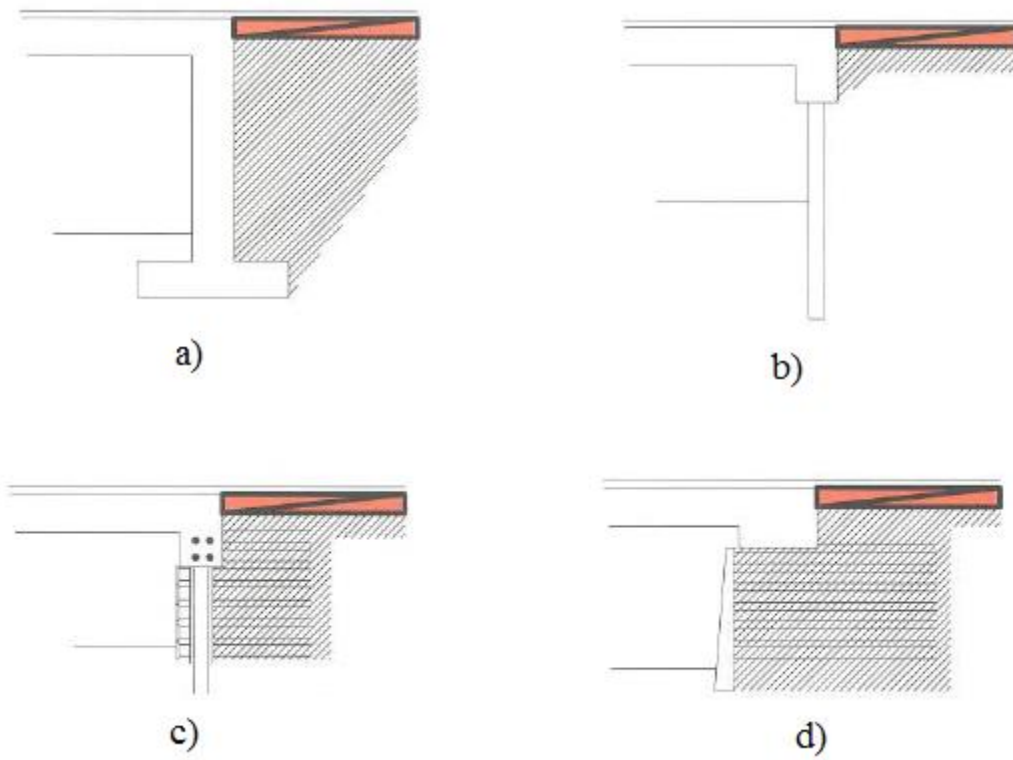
a) Full height frame b) Embedded wall abutment c) Piled with reinforced soil d) spread footing
